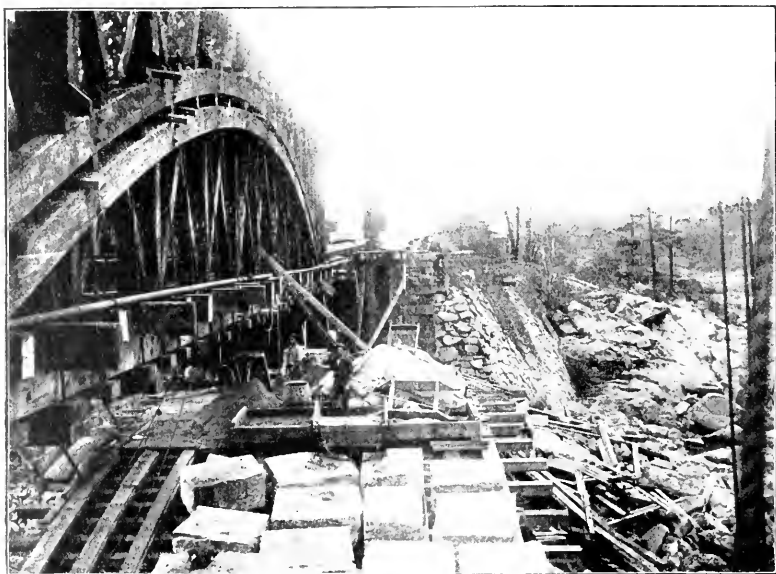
LAYING ARCH STONES AT BELLOW'S FALLS.
